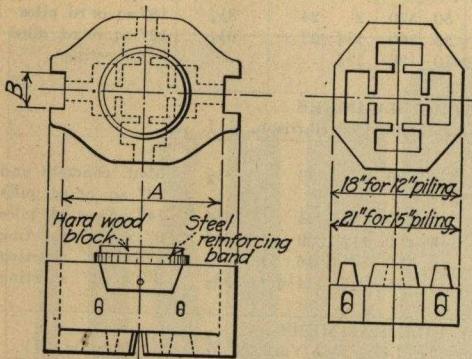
Sheet piling caps of the Jones & Laughlin Co.
